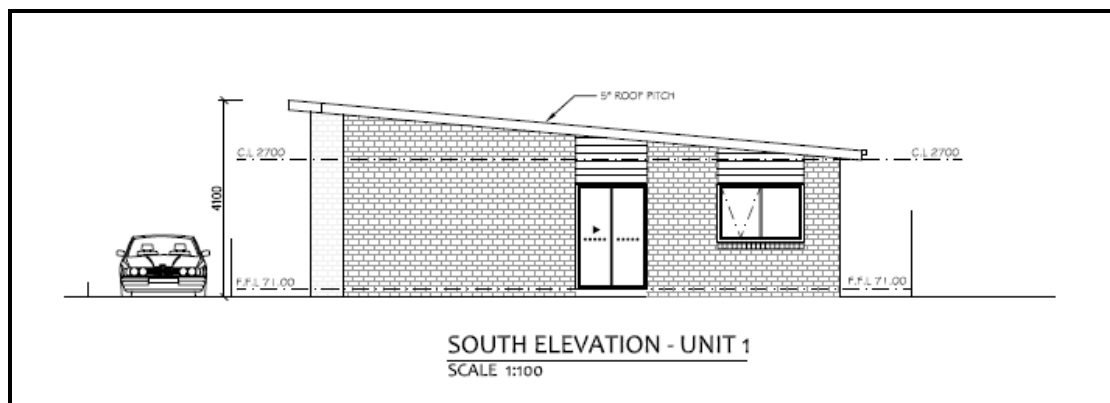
The south-western (south) elevation of proposed dwelling 1, which faces the shared driveway. The glazed doors provide access to the waste storage area from the garage and the window shown is to a habitable room.
